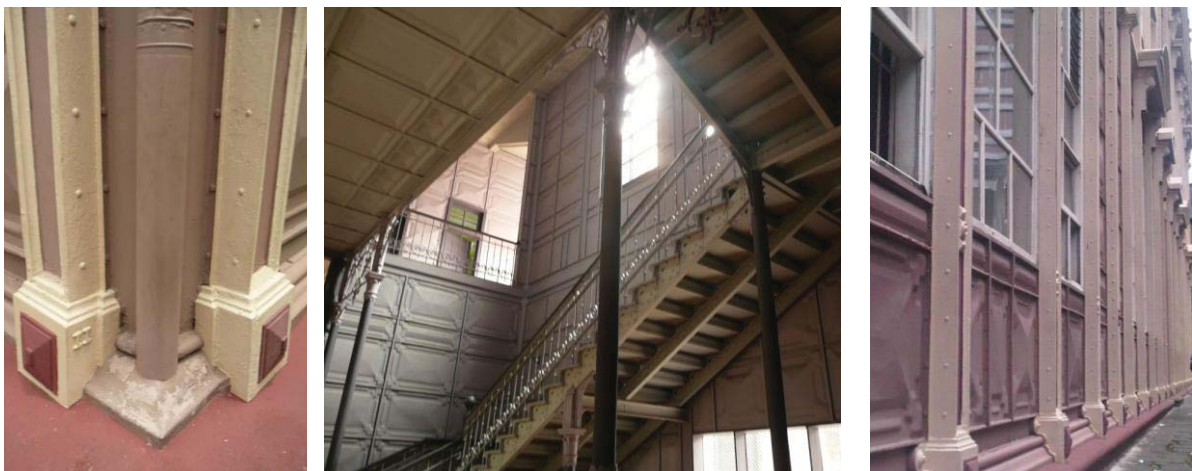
Details of metallic school, San José (Cristini-Ruiz)
